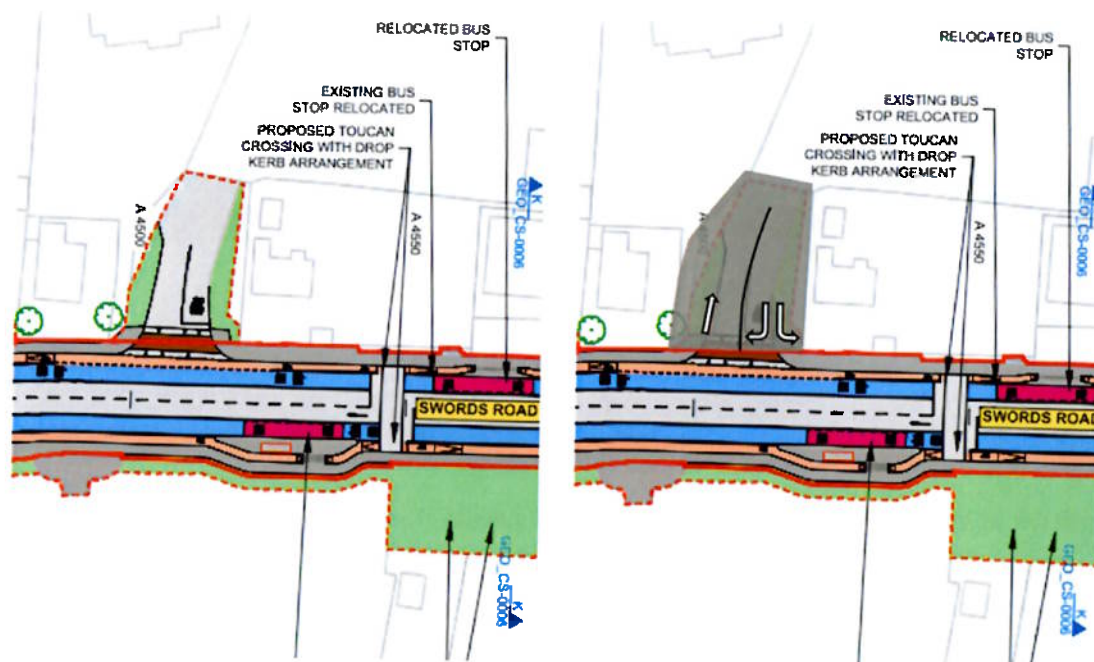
Revised entrance/exit arrangement (l) and existing entrance/exit arrangement (r).
